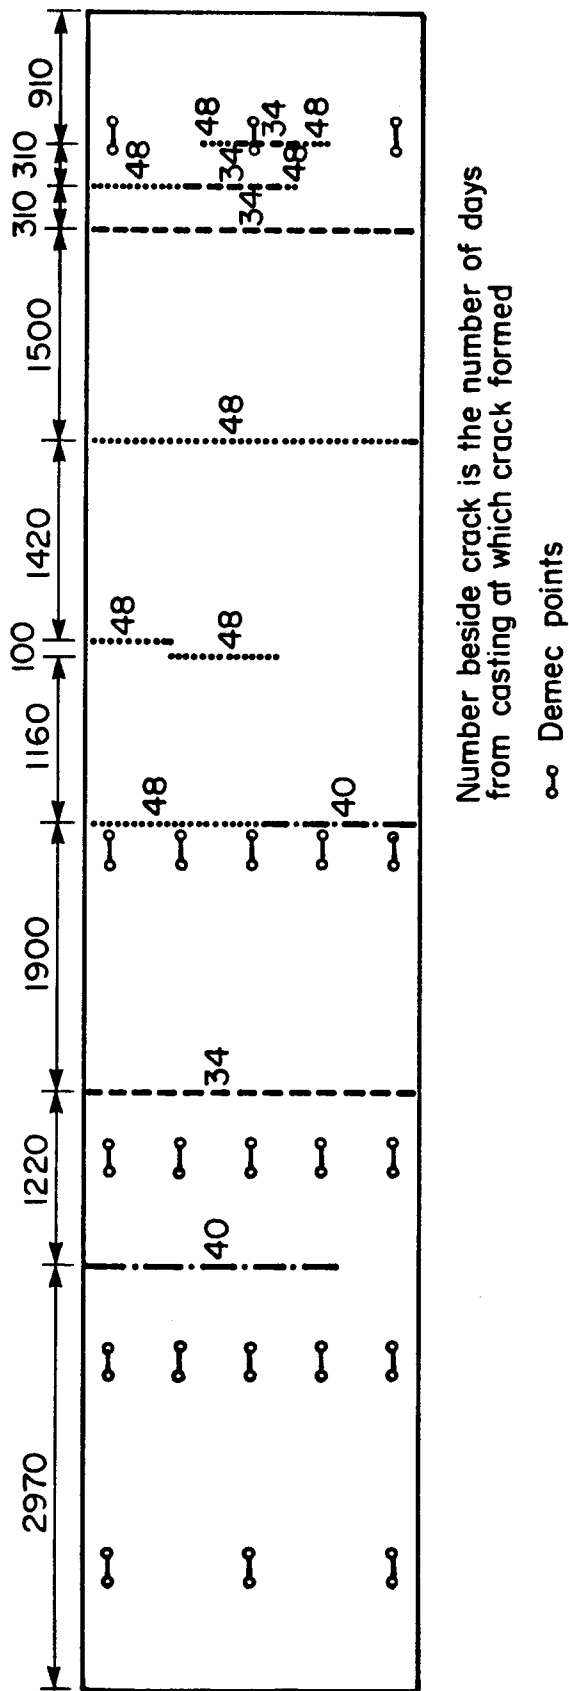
Shrinkage cracks in concrete slab - truss 2
